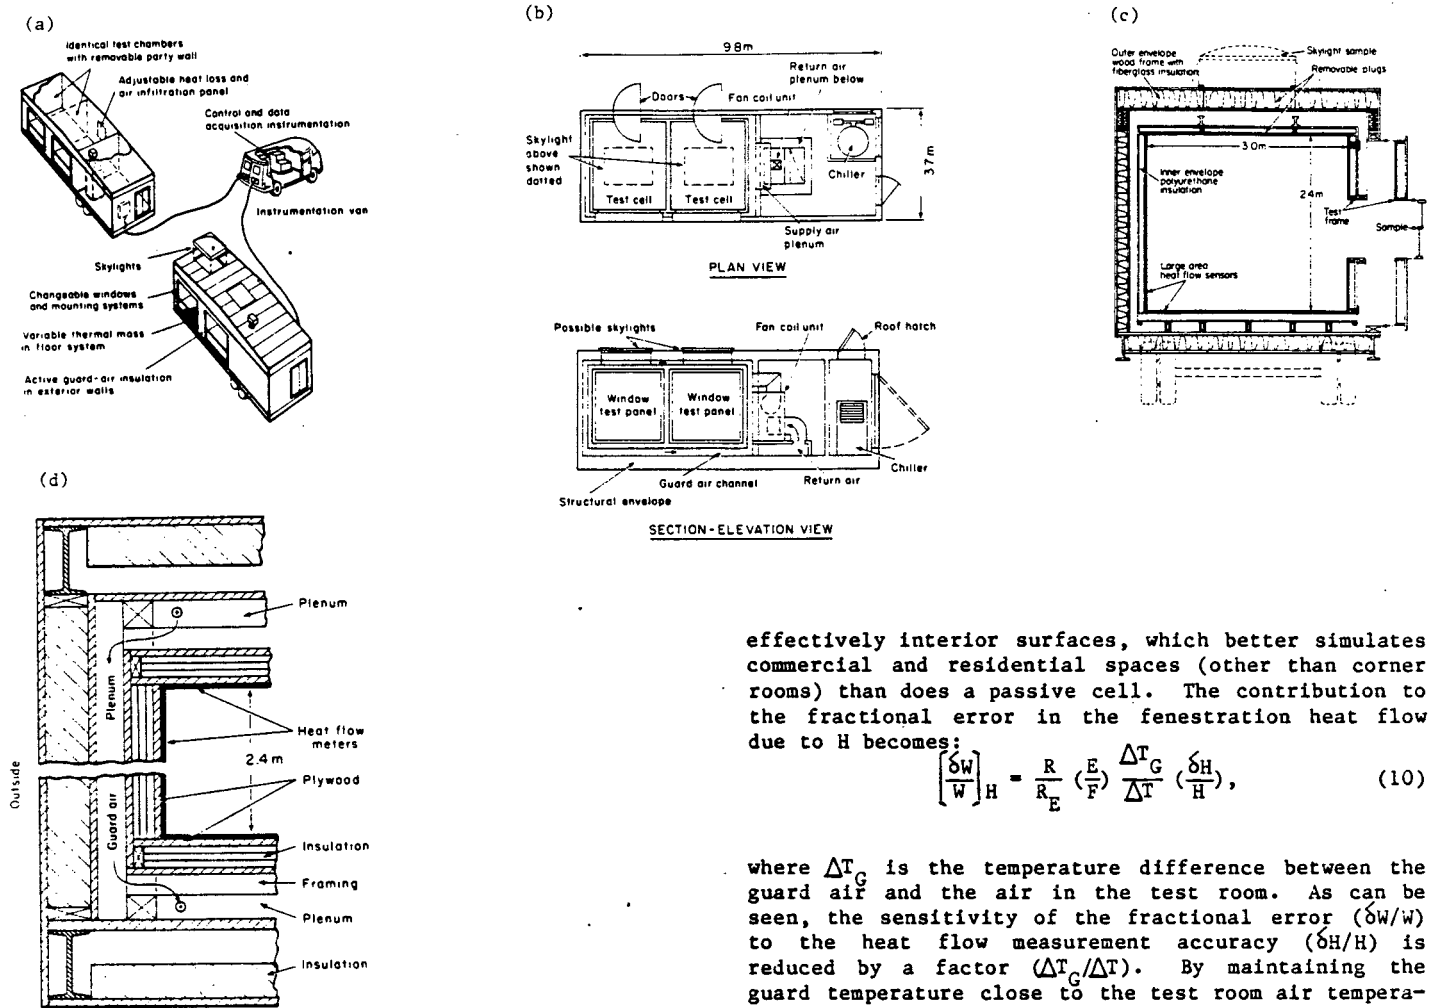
Design of the Mobile Window Thermal Test (MoWITT) facility. (a) Planned field configuration. (b) Layout of a test module. (c) Cross-section through the center of a test chamber, showing mounting of alternative window or skylight systems. (d) Detailed envelope cross-section.
